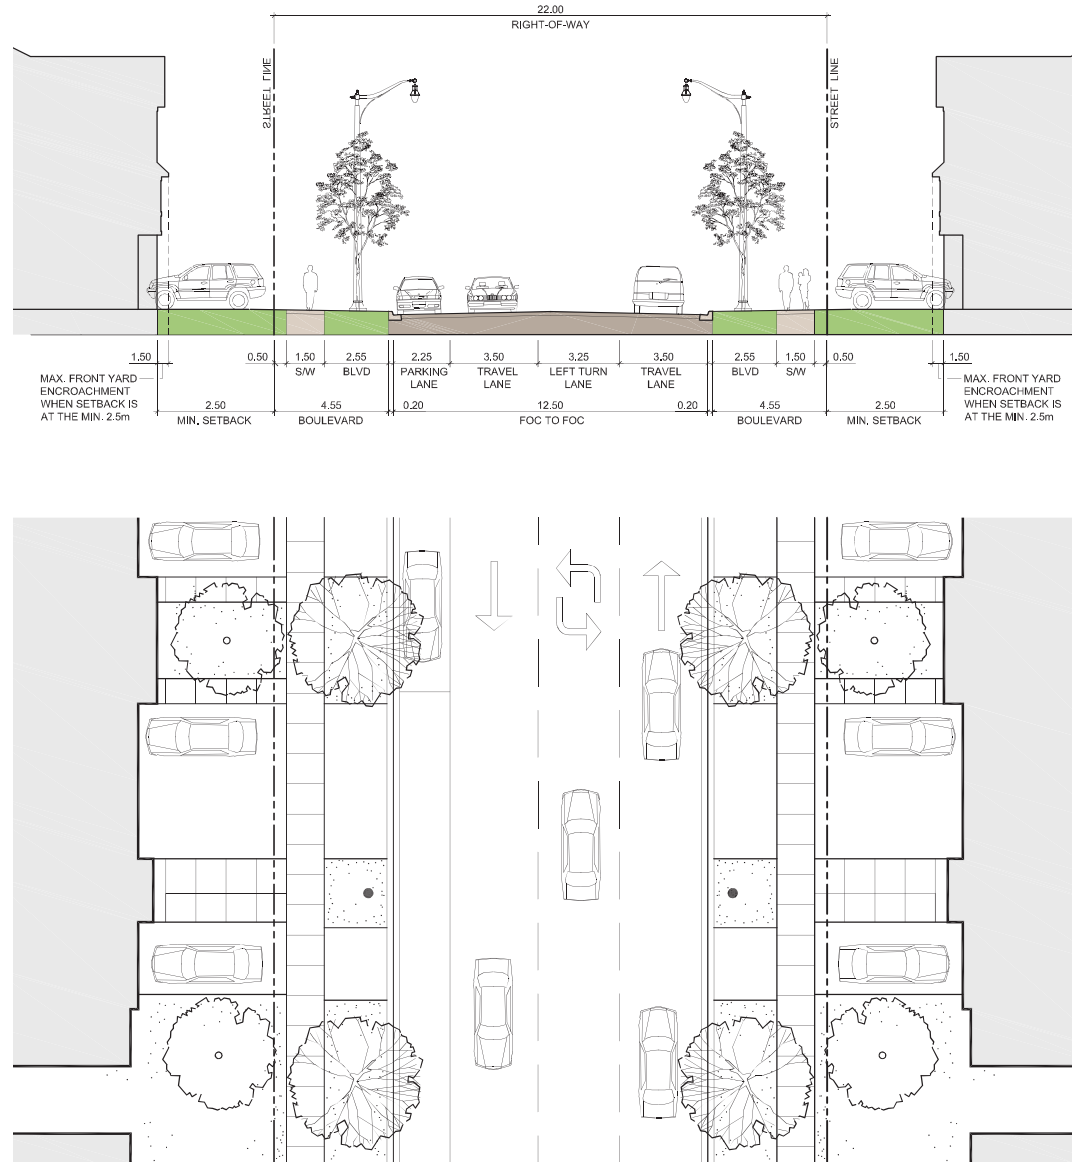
Minor Collector Road - 22.0m R.O.W. / 2 travel lanes / on-street parking on one side / 4.55m boulevard.
